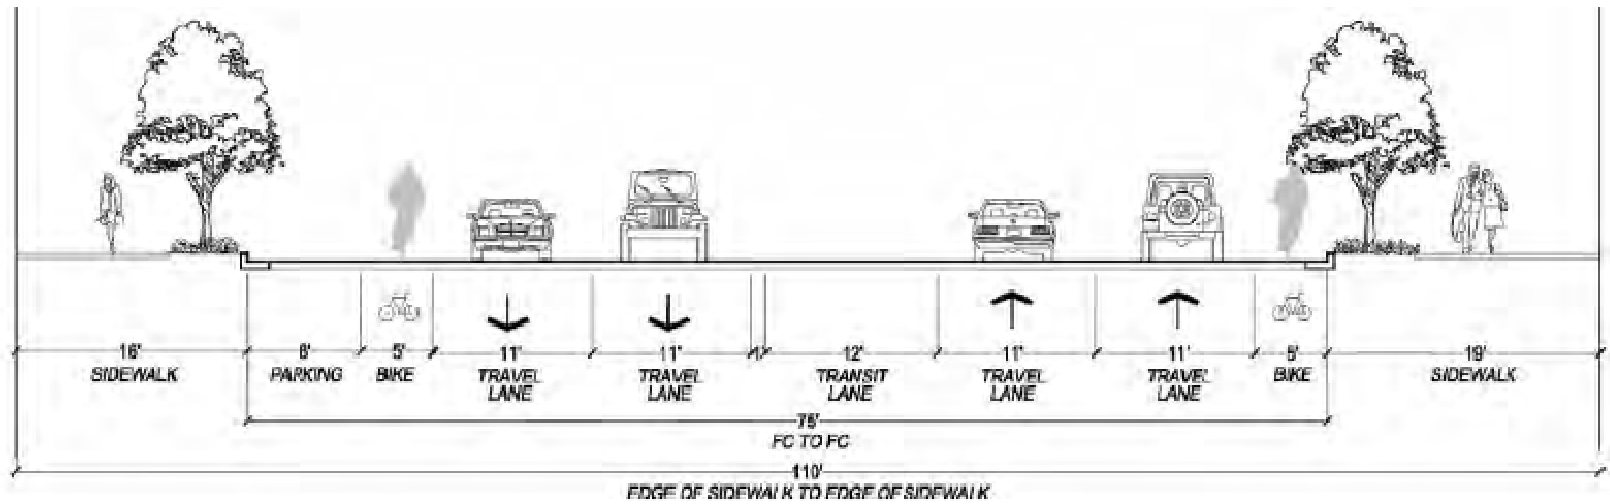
Recommended mid-block cross-section of 18th Street S. looking west between Crystal Drive and S. Clark/Bell Street
